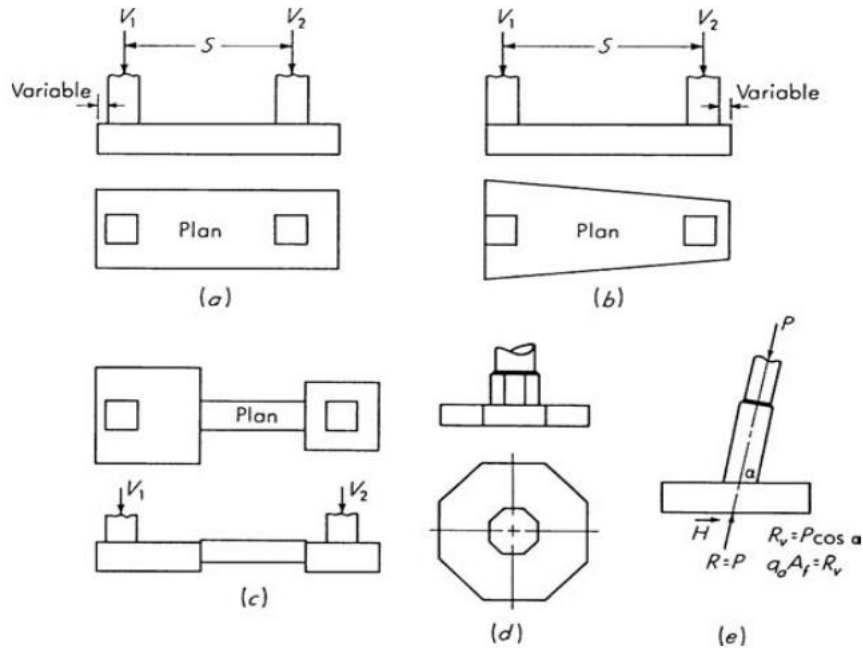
Examples of shallow foundations: a) combined footing; b) combined trapezoidal footing; c) cantilever or strip footing; d) octagonal footing; e) eccentric loaded footing
